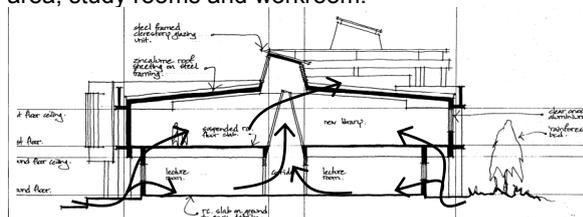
Sectional drawing of building showing conceptual natural ventilation air paths through the ground and first floor and out through the clerestory.
